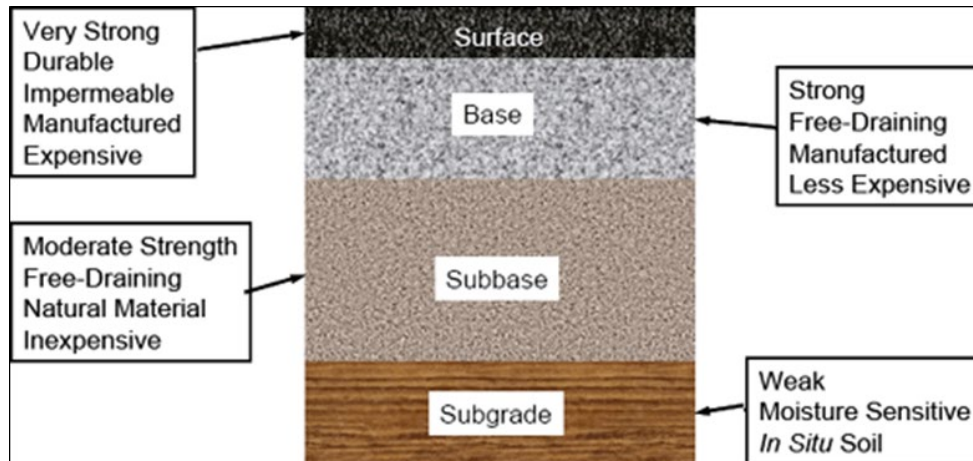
Layers of conventional asphalt pavement structure (Barry et al., 2006)
